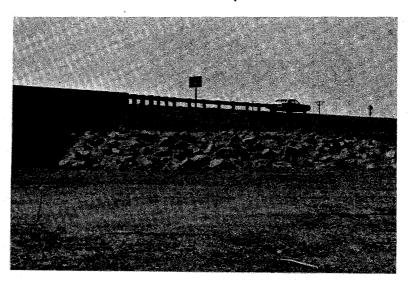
Use of concrete-grouted riprap for protection of abutment. (Stony Creek, Calif.; Site 75.)
